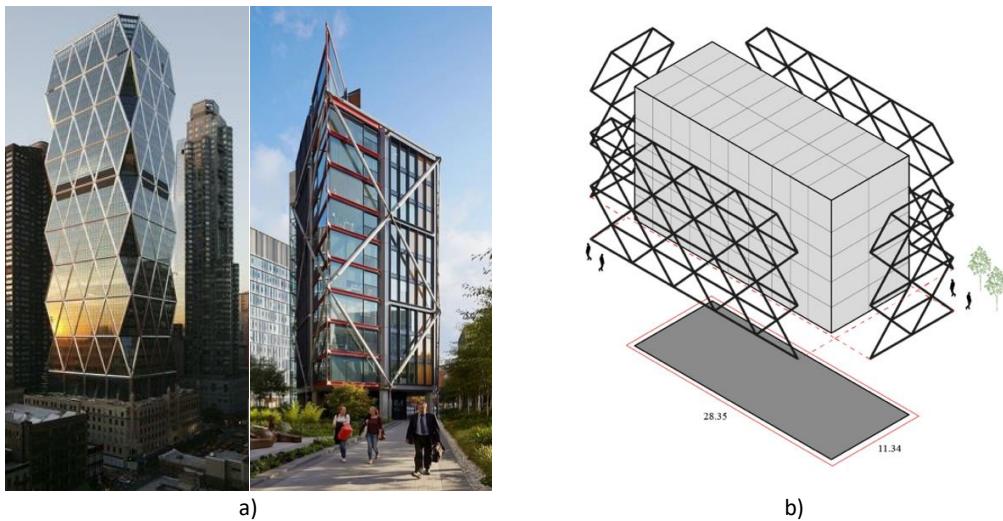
Diagrid for the construction of new tall buildings (a); diagrids for the seismic retrofit of existing RC buildings (b).
